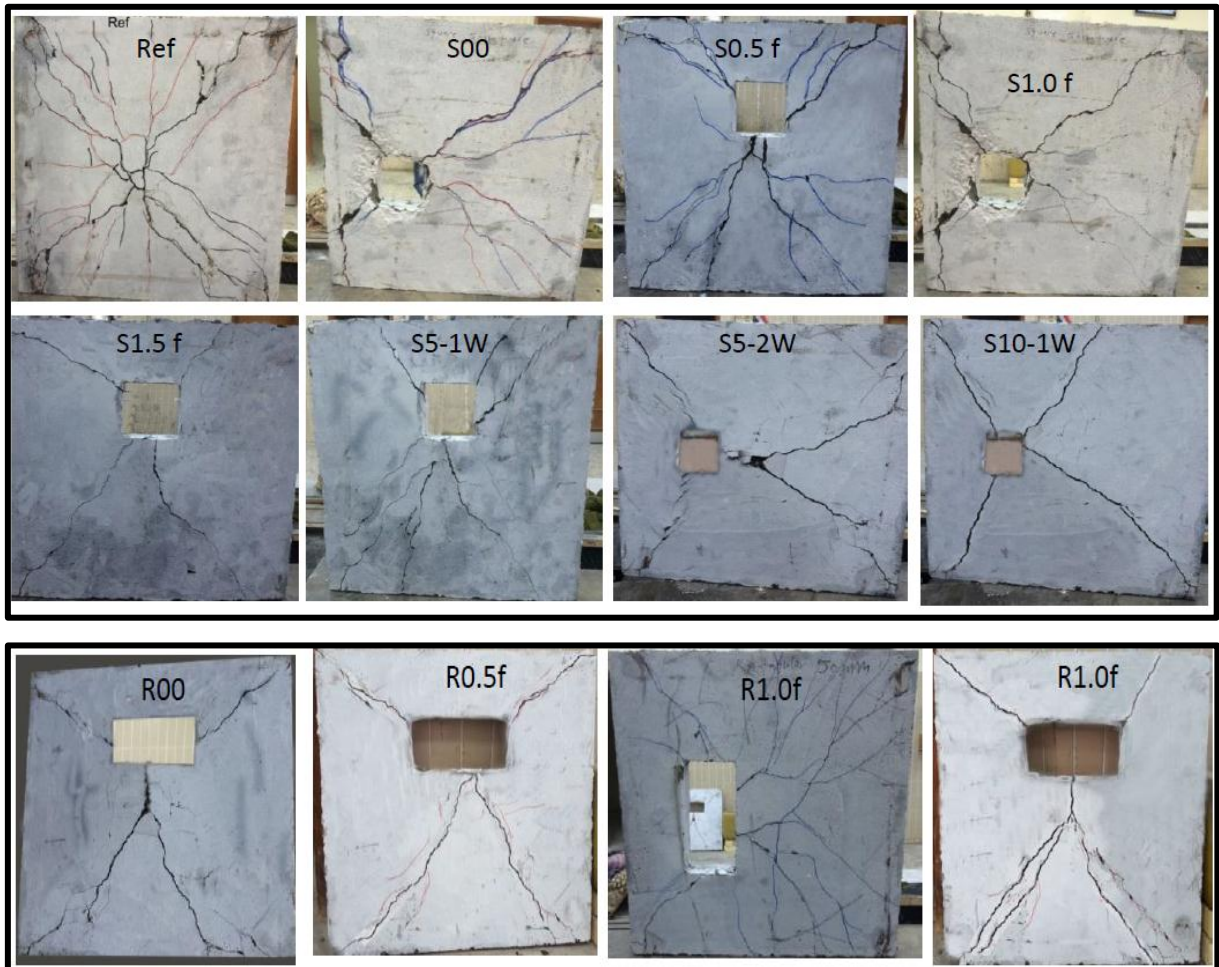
Crack pattern and failure mode of control slab and slab with openings (Chkheiwir & Abdullah, 2017).
